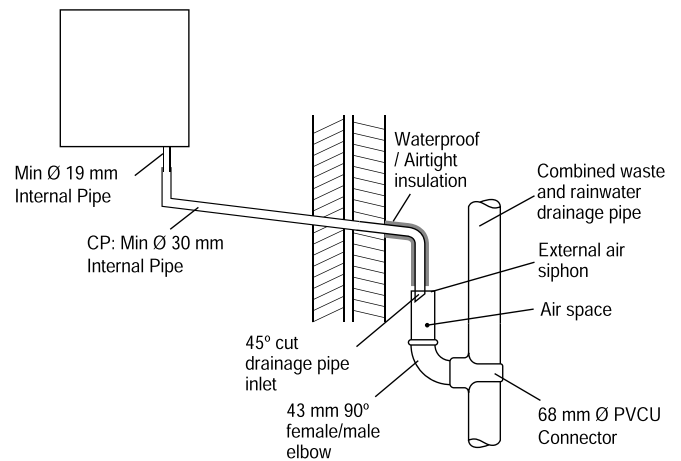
Outdoor Connection of a Condensate Drainage Pipe
